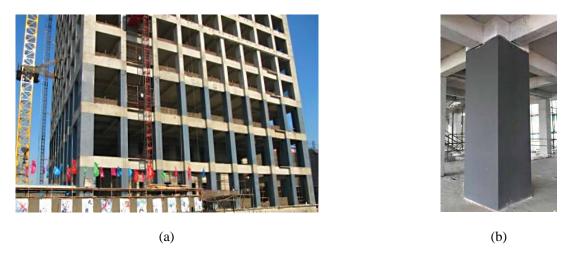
A typical building using STCRC columns [1]: (a) STCRC columns in the bottom three stories; (b) details of a STCRC column.
